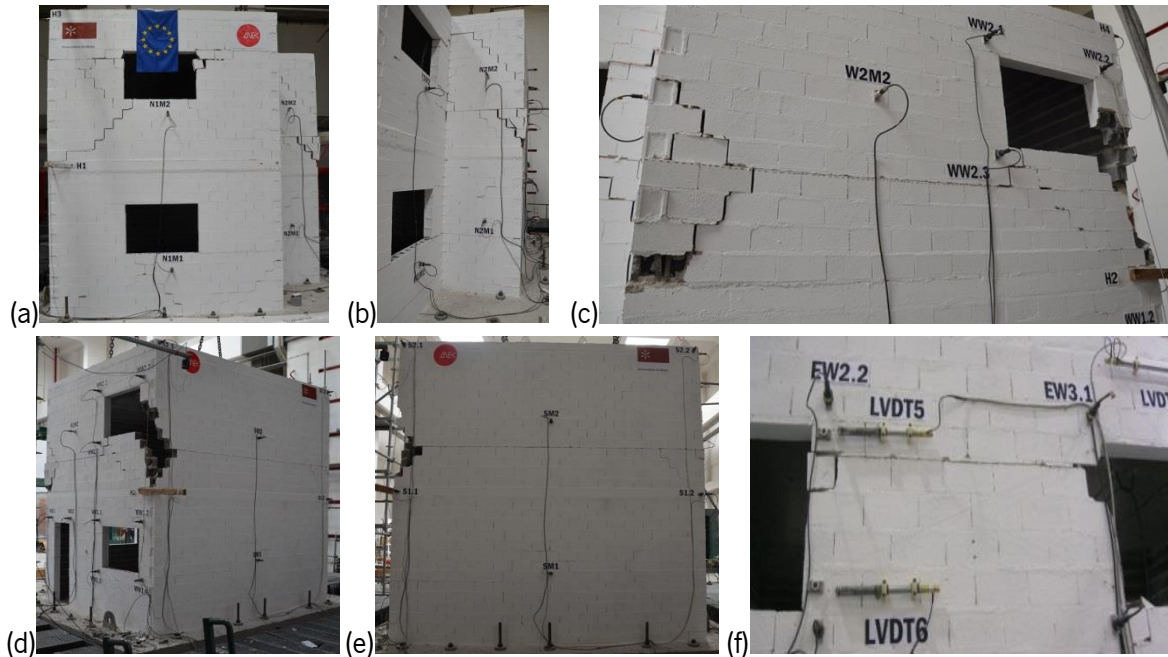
Final damage in the asymmetric unreinforced masonry building: (a) north 1, (b) north 2, (c) west 2 at second level, (d) corner between west 2 and south walls, (e) south wall and (f) east wall at second floor
